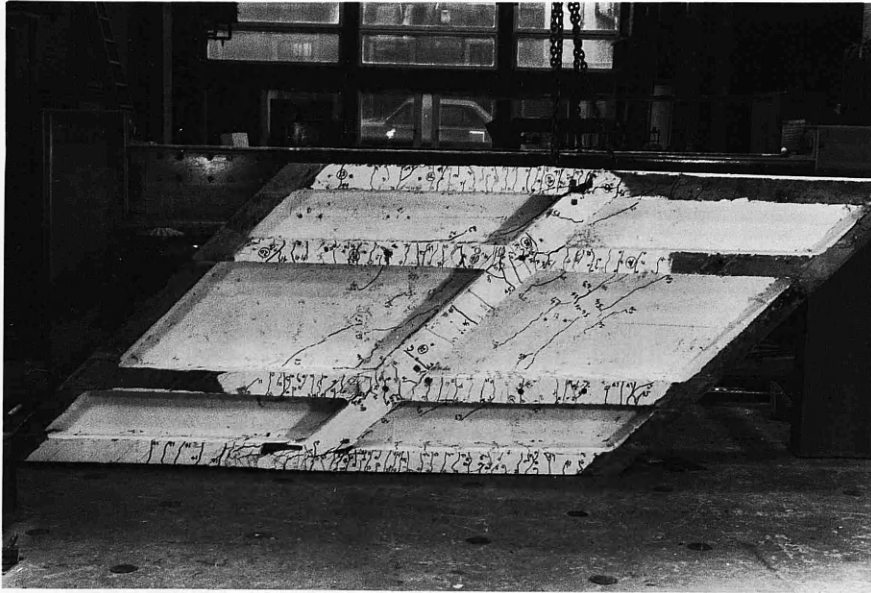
MODEL RIBBED SKEW SLAB NO. (6) Crack pattern at the bottom surface after failure
